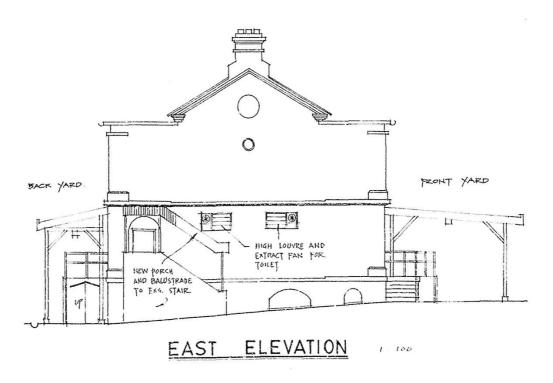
Proposed renovation on east façade, extracted from Architectural Proposed Plan for Kowloon Park, Drawing No. ASM/ 5704, dated 1986. (Source: Architectural Services Department)
